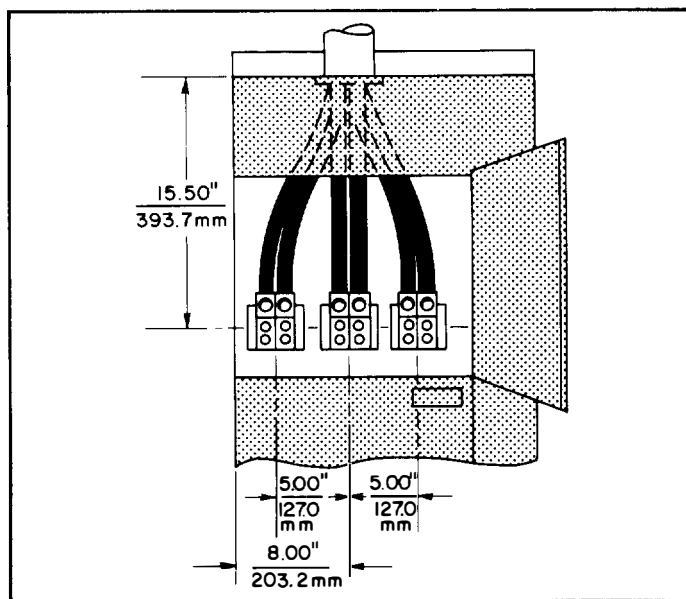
Typical top entry of main cables to incoming line lug compartment.
